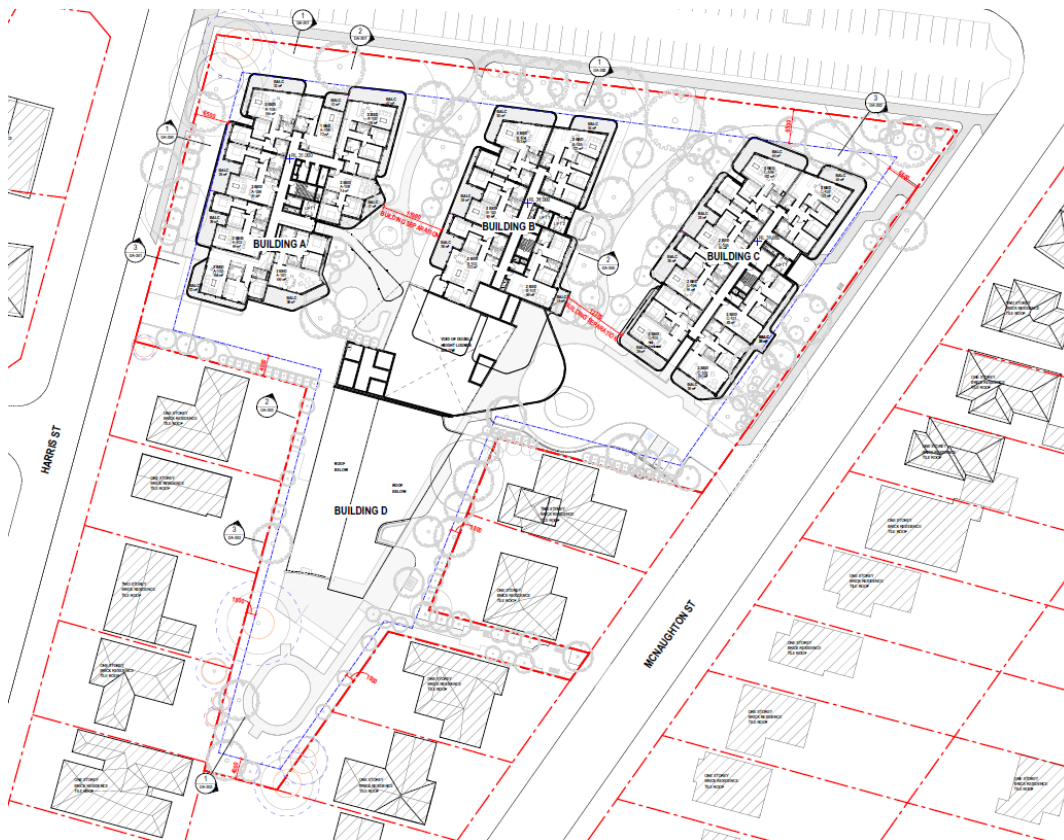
Level 1 Plan of the proposed development (Jackson Teece)
